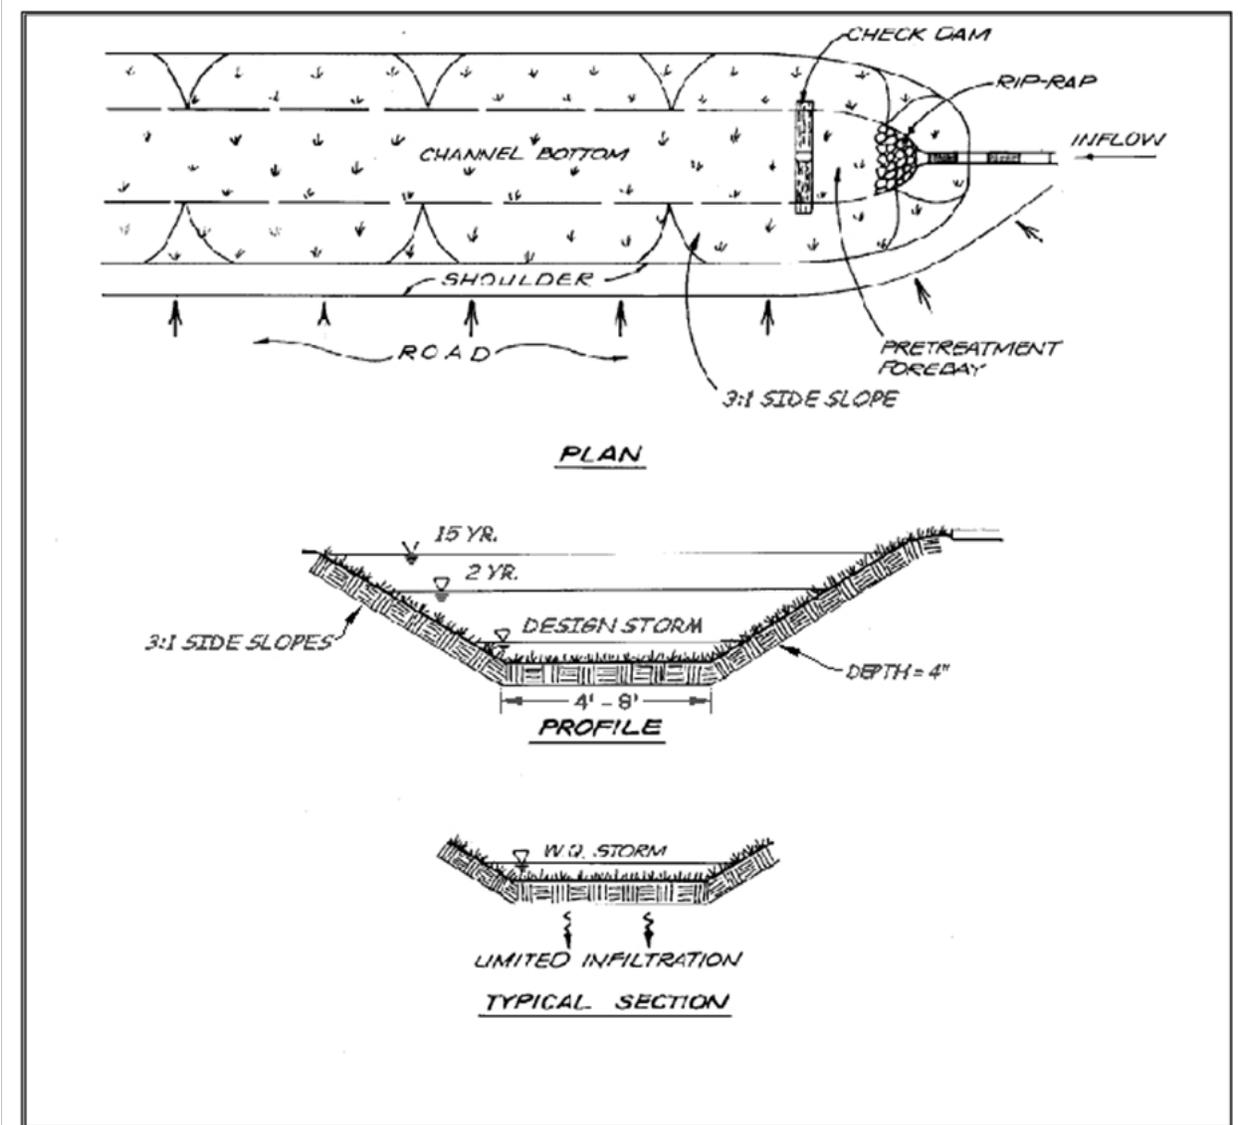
Grass channel typical plan, profile, and section views (O-1).
